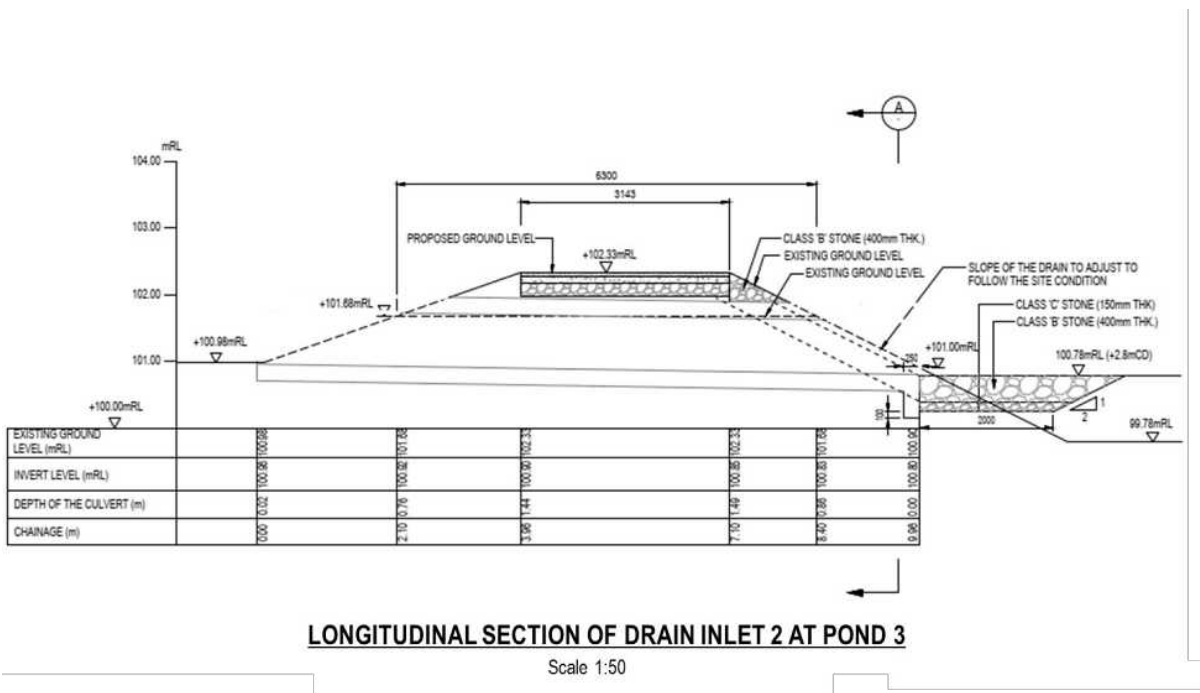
Cross-sectional view of proposed drain inlet 2 at Pond 3.
